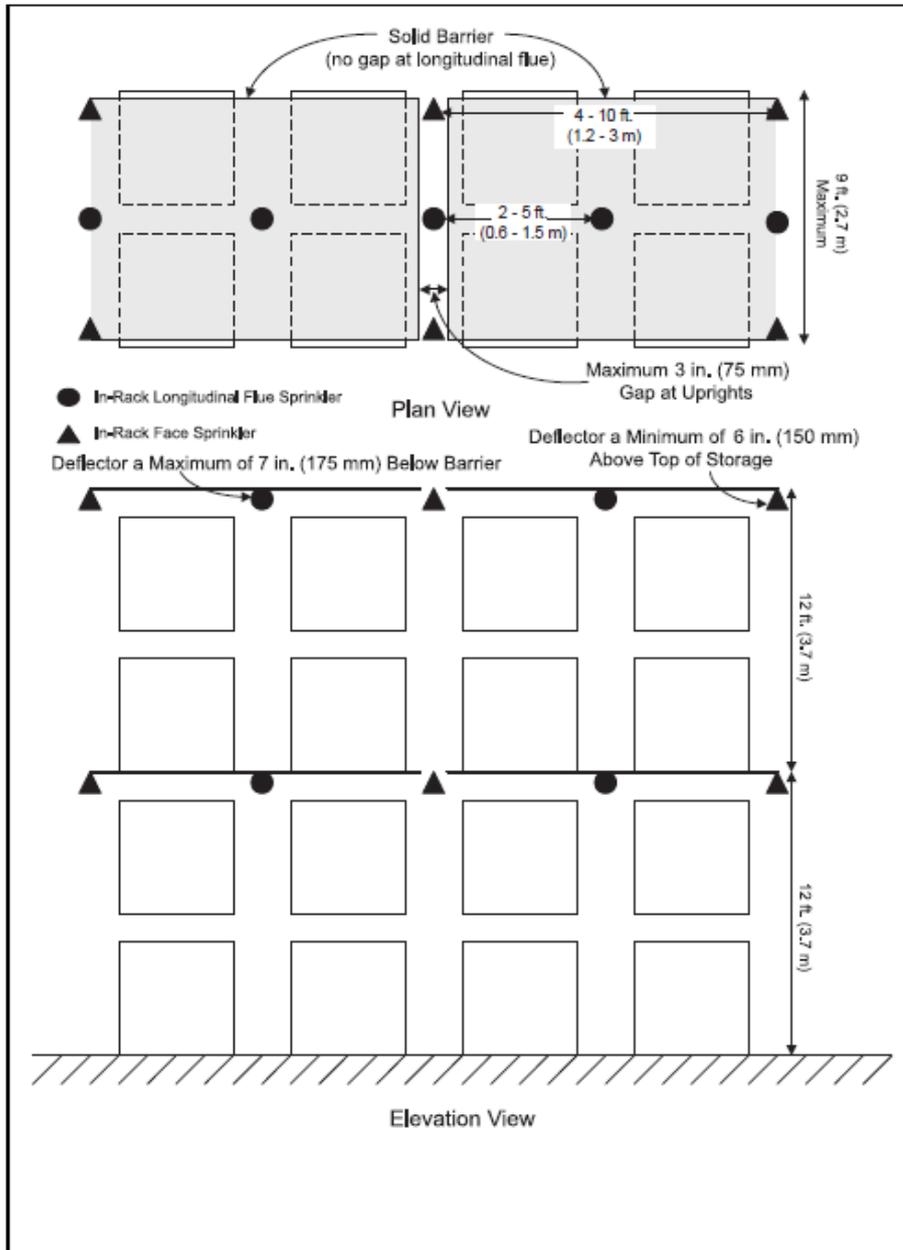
Double-row rack sprinkler layout: fire protection scheme A
